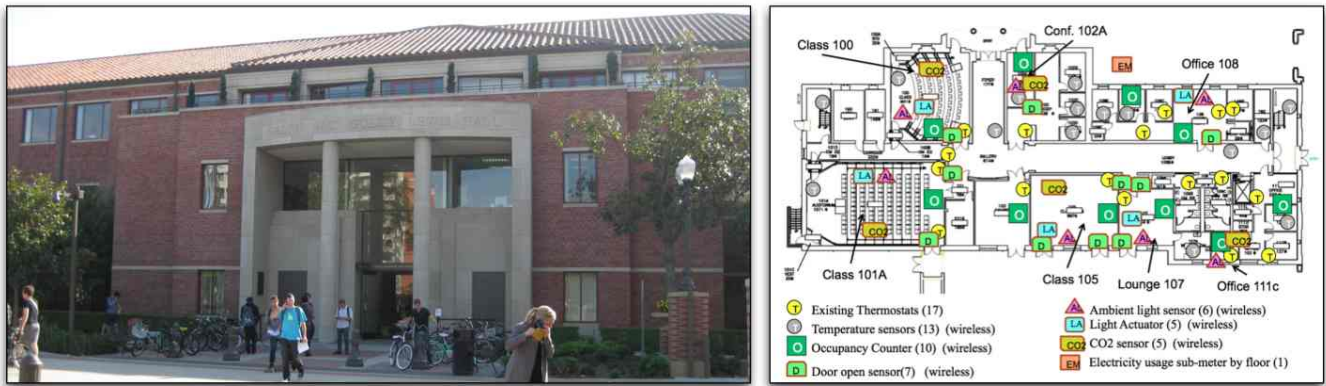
(Left) The BLEMS testbed: University Building. (Right) Floorplan of first floor deployment.
